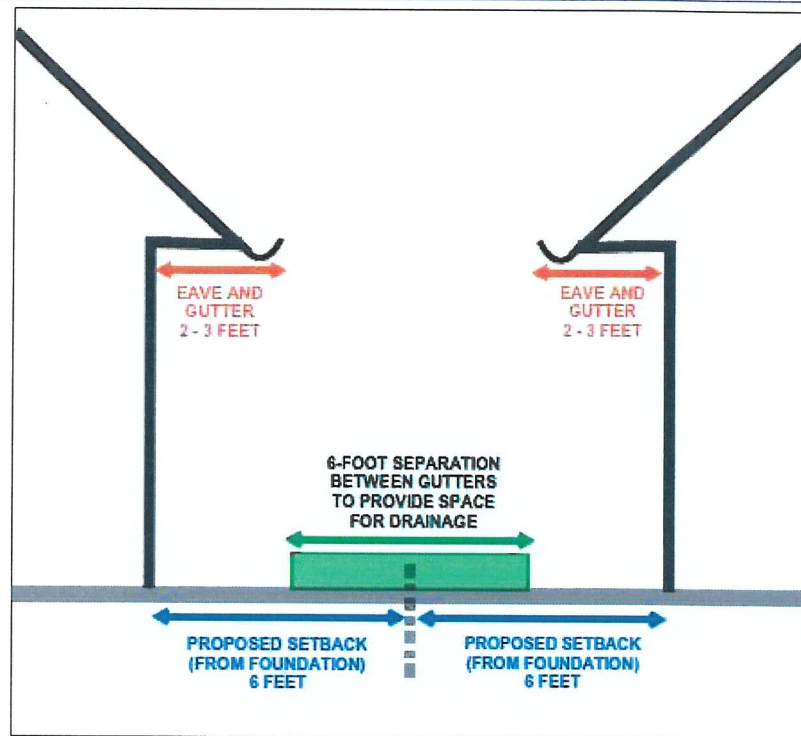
Separation between accessory structures on adjacent lots, as proposed.
